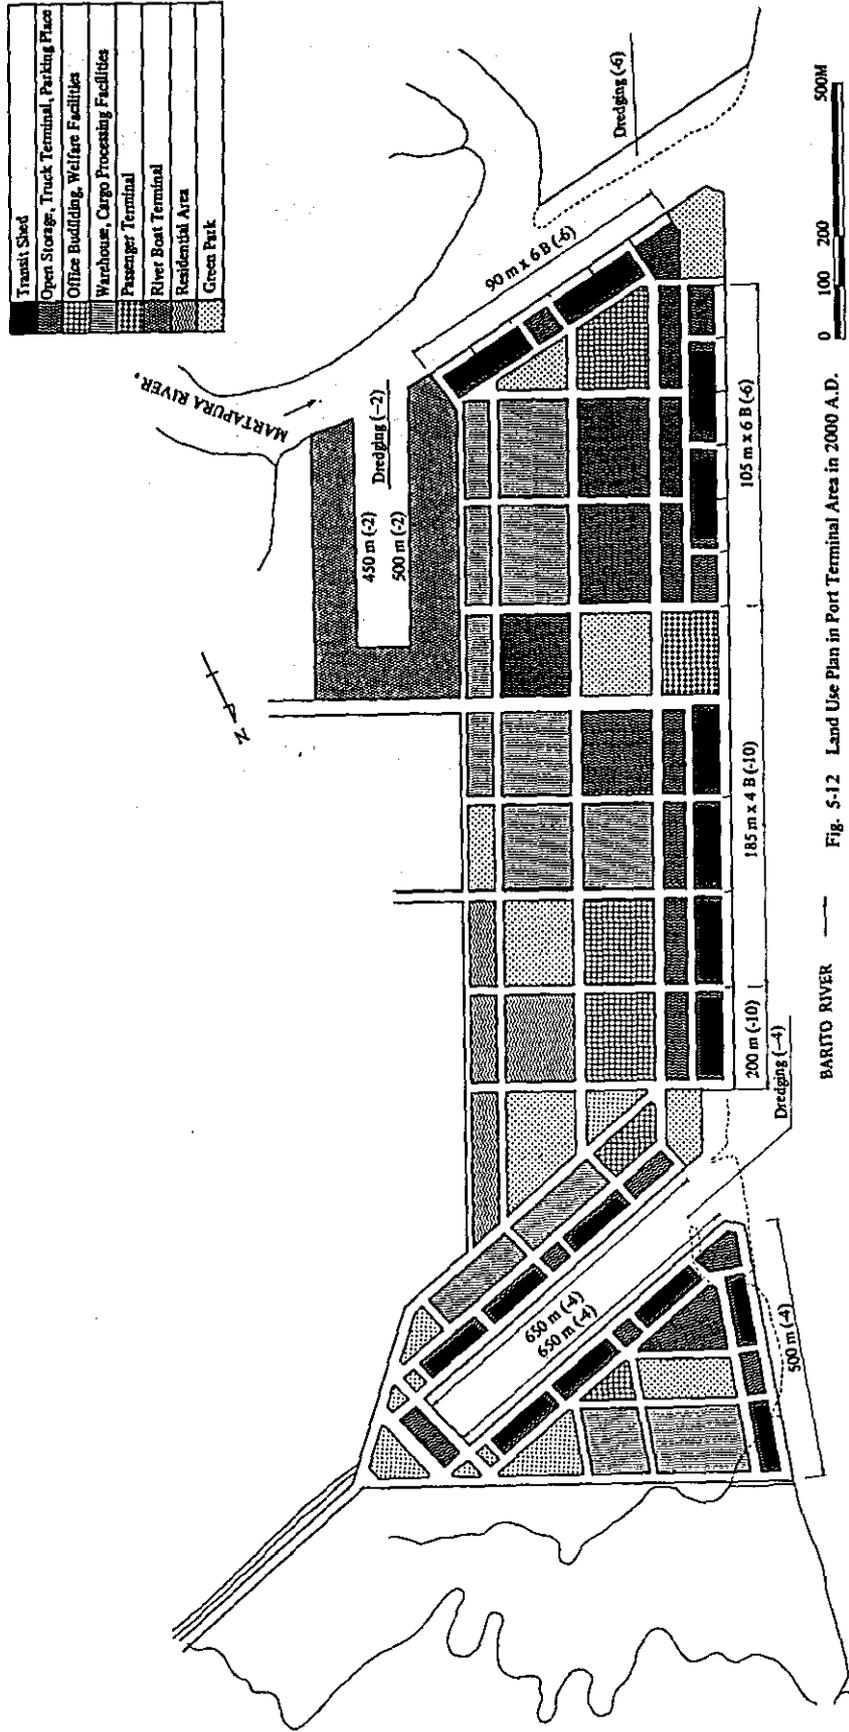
Land Use Plan in Port Terminal Area in 2000 A.D.
